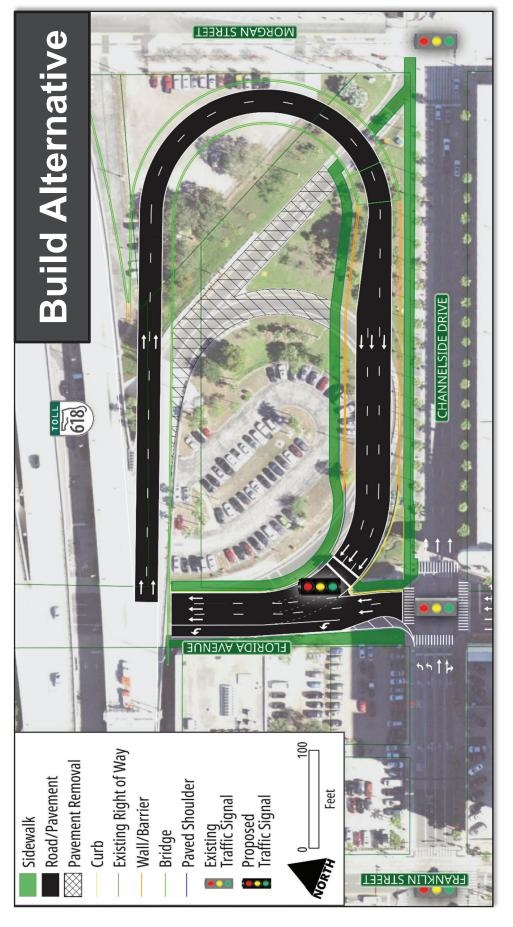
Alternative 1 – Florida Avenue Off-ramp (Exit Ramp 6A)
